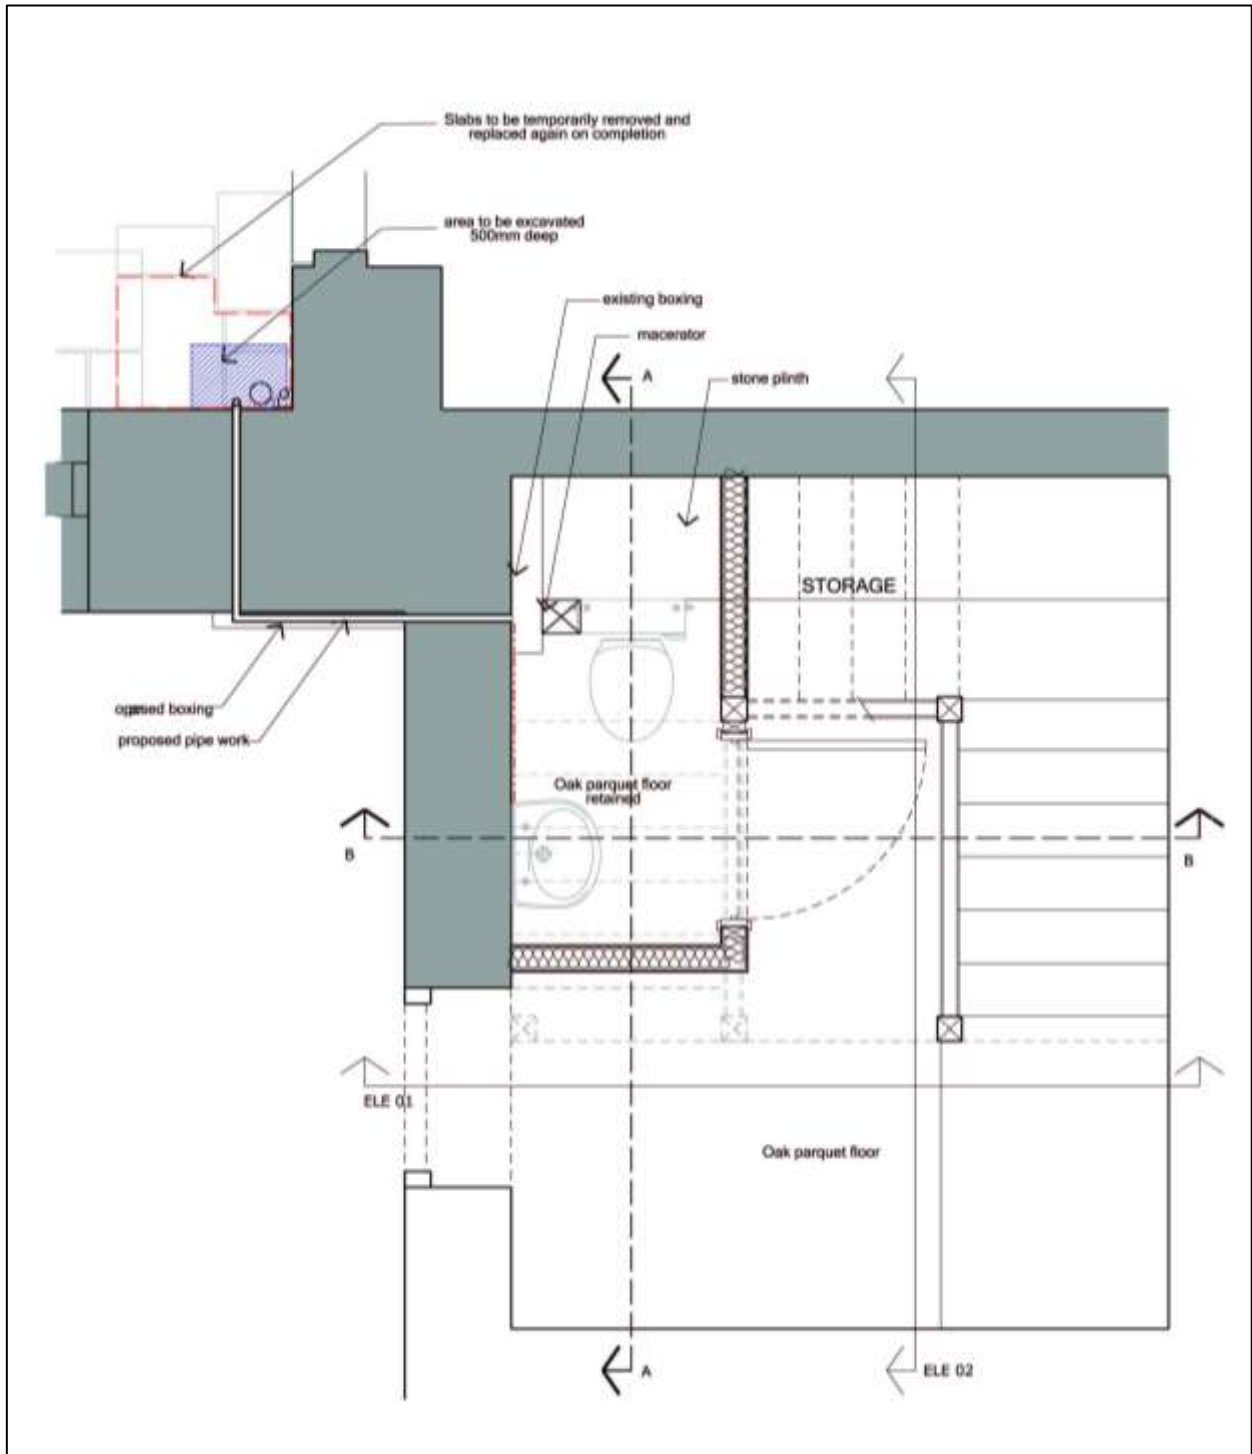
Plan showing extent of engineering works (excavation area shaded blue)
